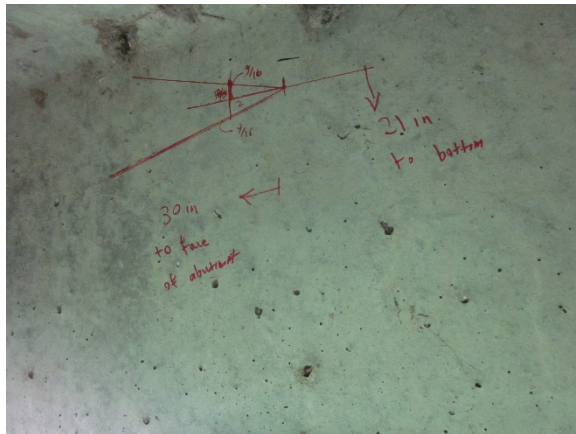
Girder Strain Gauge Instrumentation Plan for Shear Response of 30-in. (762-mm) Deep Double-Tee Girder Bridge – Elevation View
